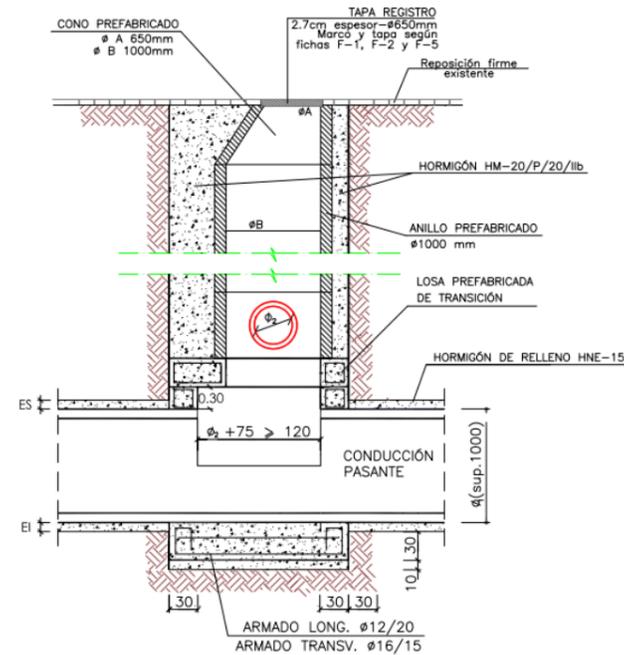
Registration well type elevation. Source: Ayuntamiento de Valencia, 2015
